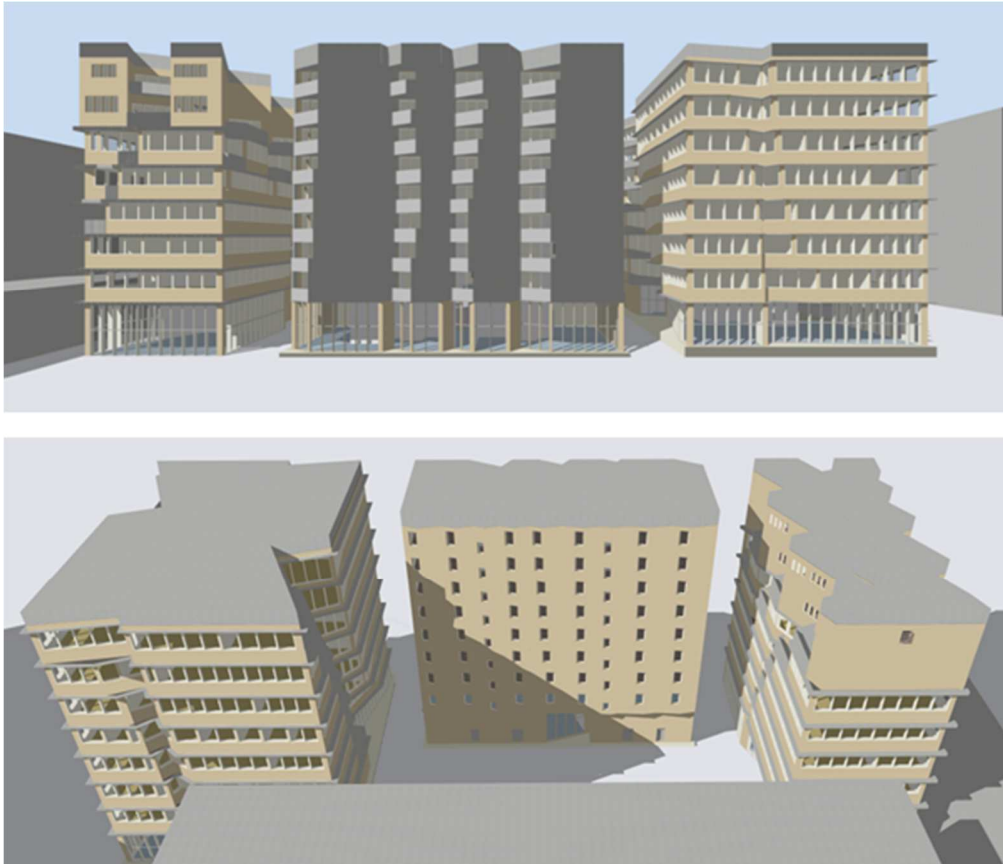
South facade (top) and north facade (bottom) – DesignBuilder model
